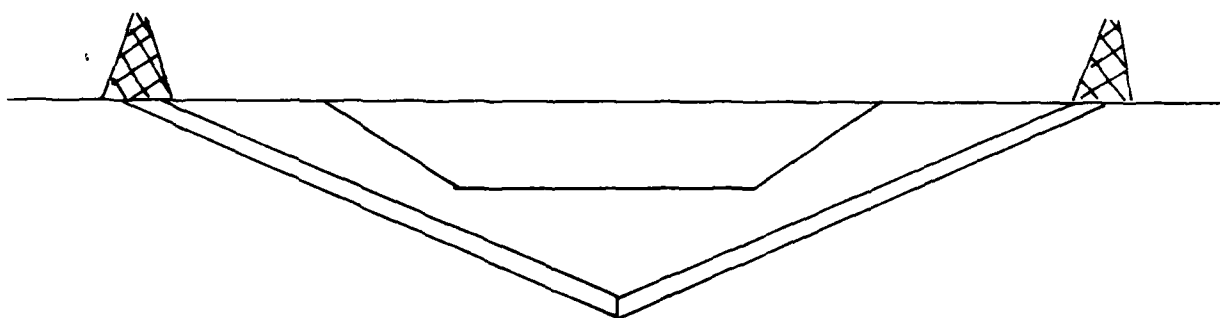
Bottom Sealing of a Lagoon via Horizontal Drilling
